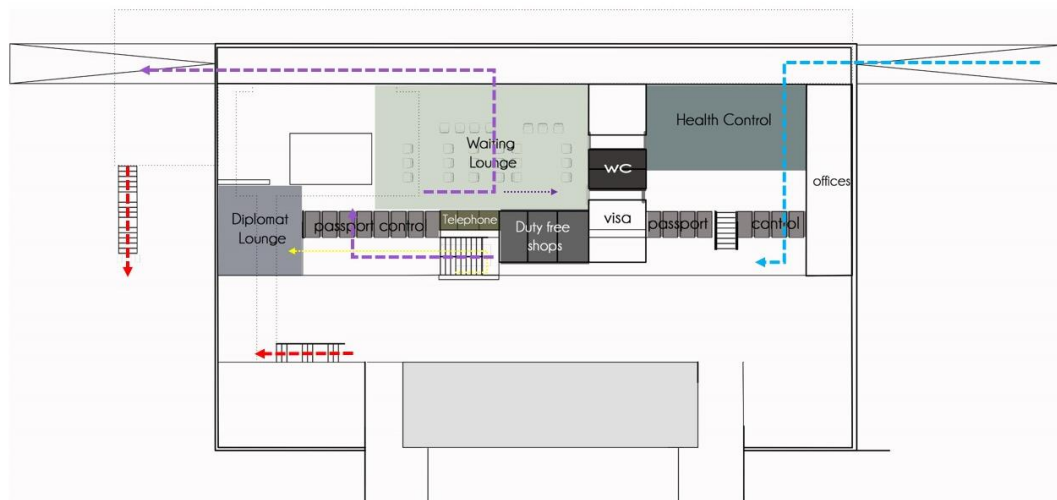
Estimated First Floor Plan Circulation Pattern (By Author).
